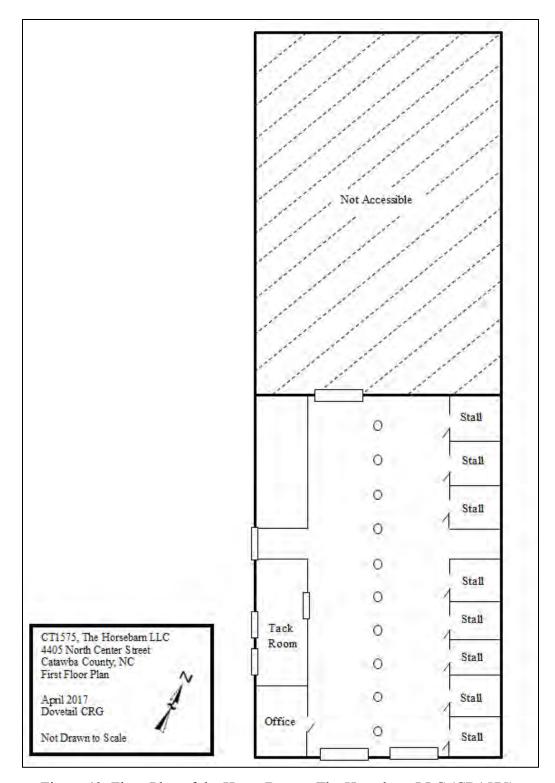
Floor Plan of the Horse Barn at The Horsebarn LLC (CD1575).
